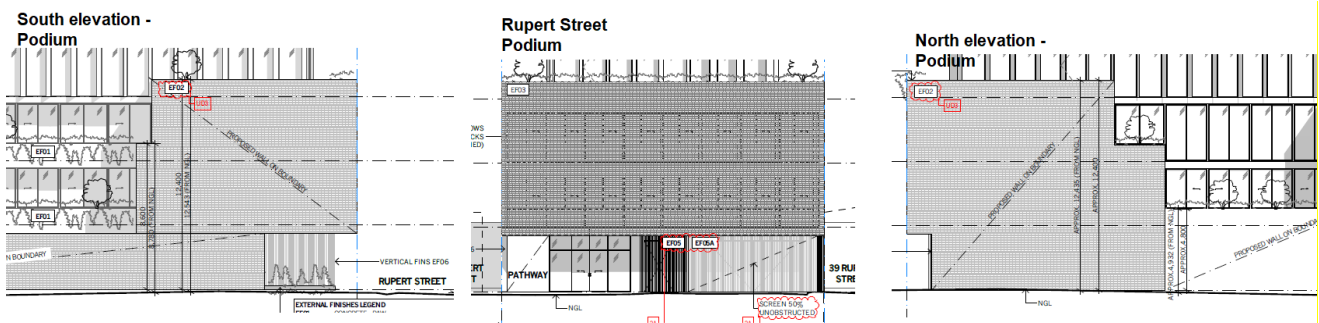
Rupert Street podium with north and south podium elevation as per the sketch plans provided 24th September.
